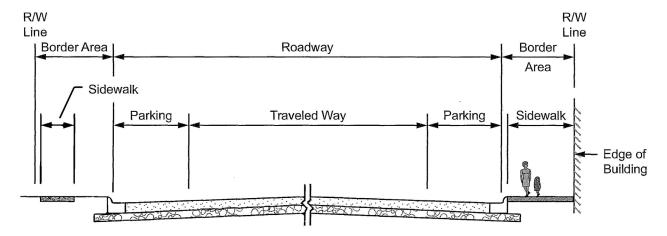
Urban Area with On-Street Parking and Sidewalks
